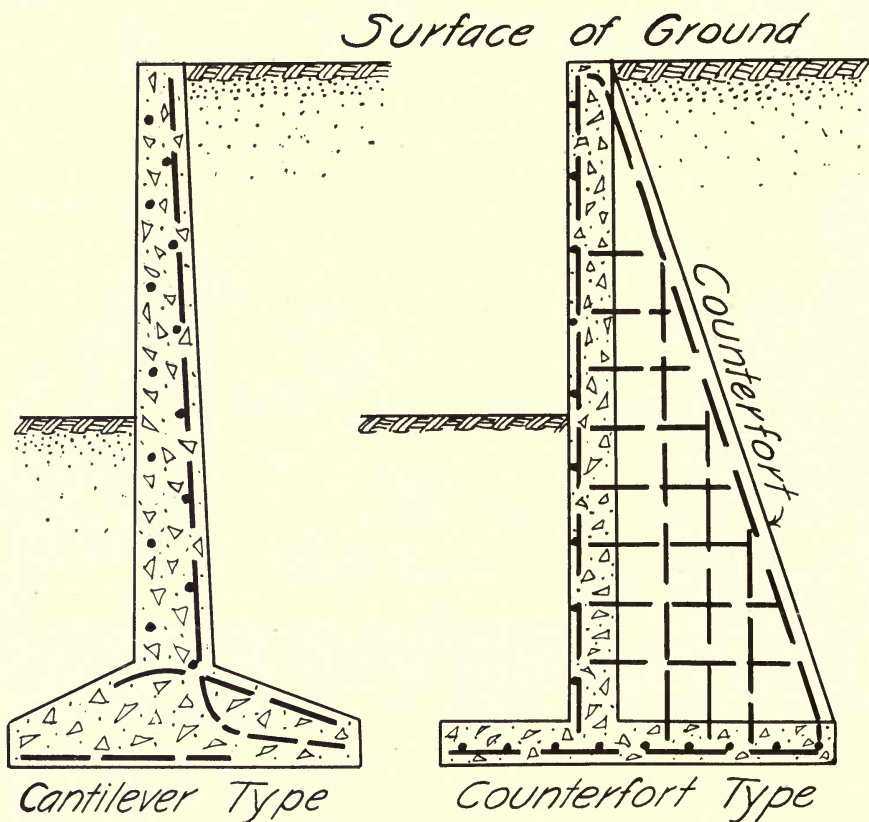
TYPES OF REINFORCED CONCRETE RETAINING WALLS
